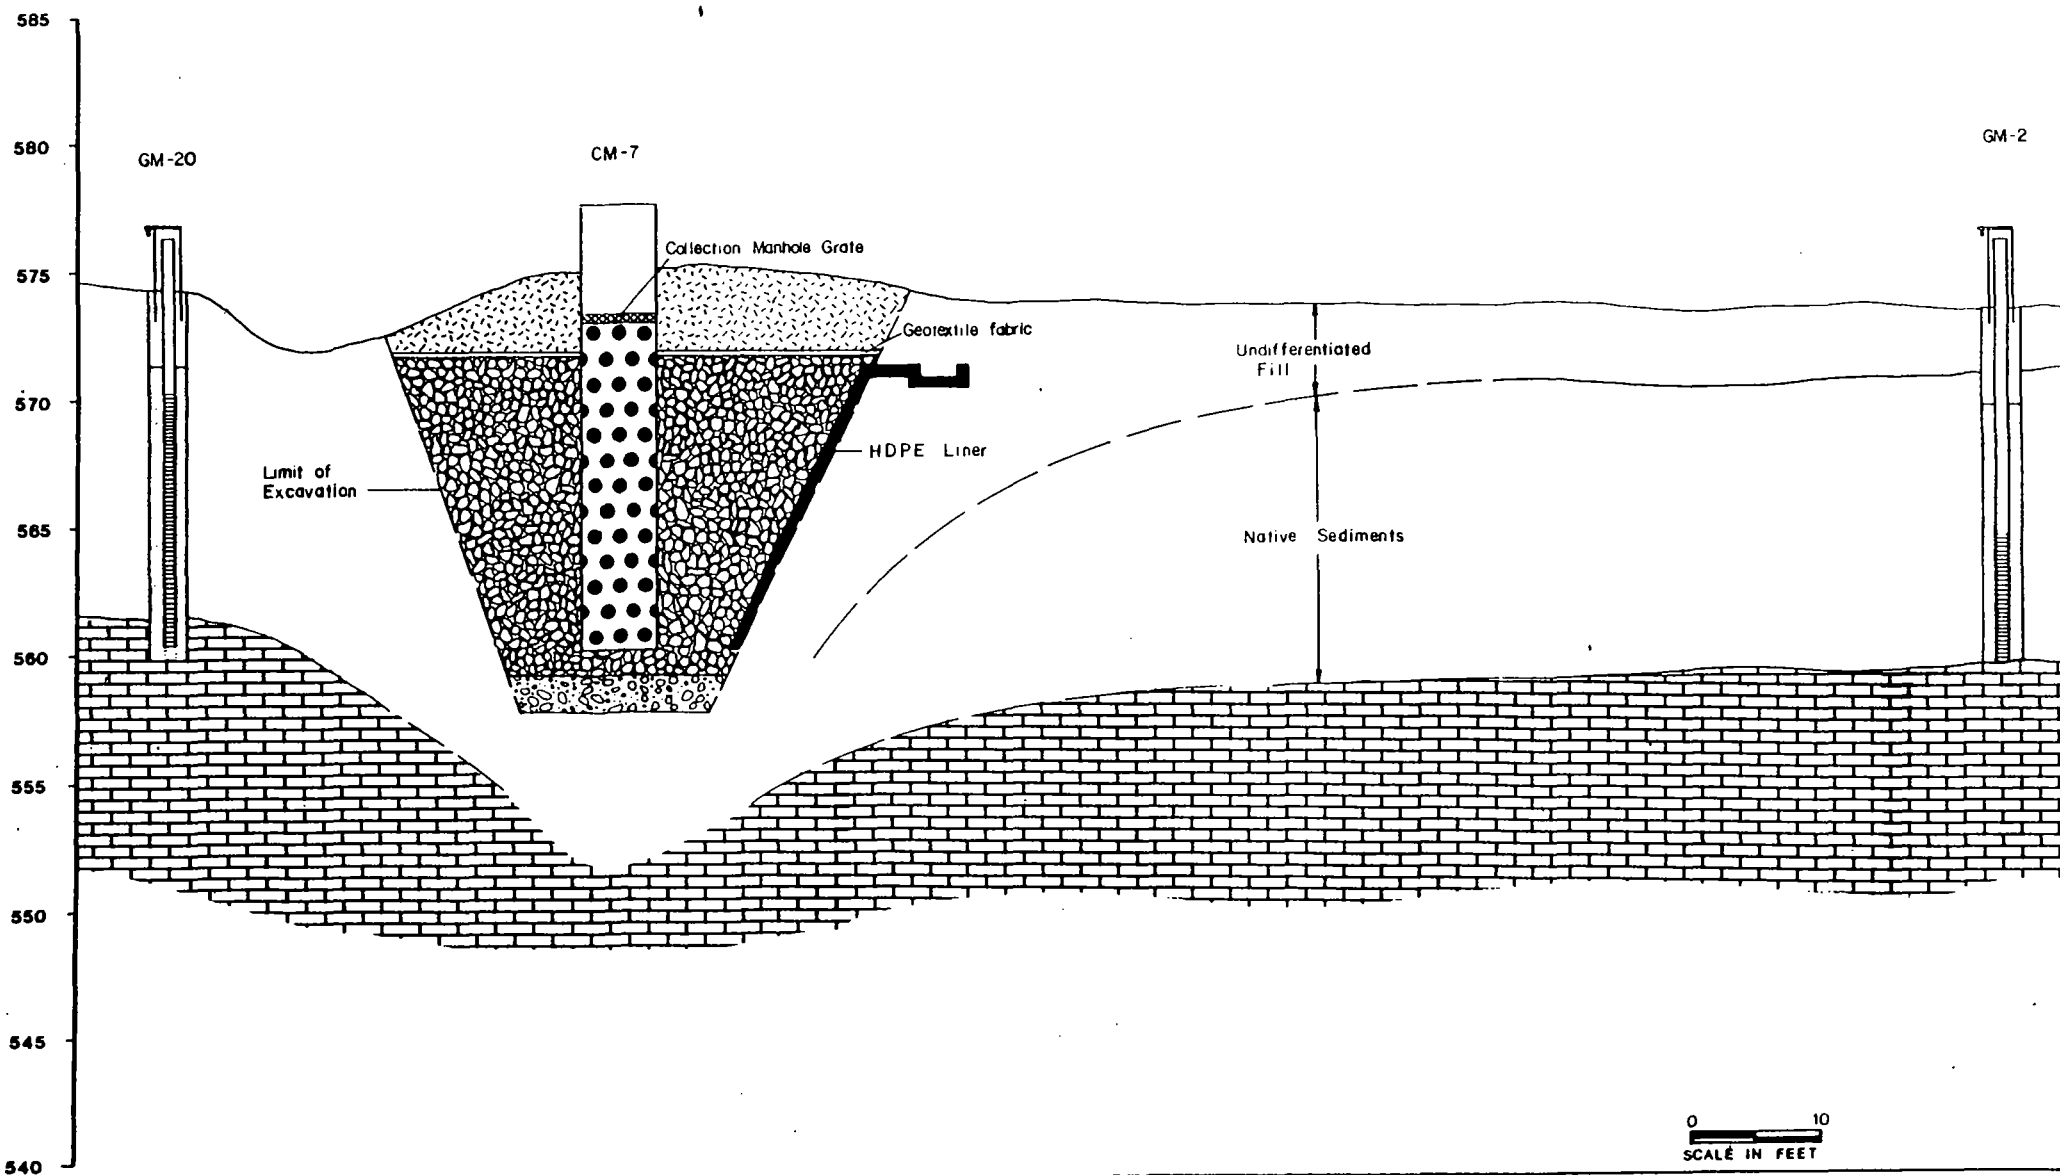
Cross Section I-I' of the Northeast Corner of the Oil-Interception Trench at the Alcoa-Davenport Waste Site.
